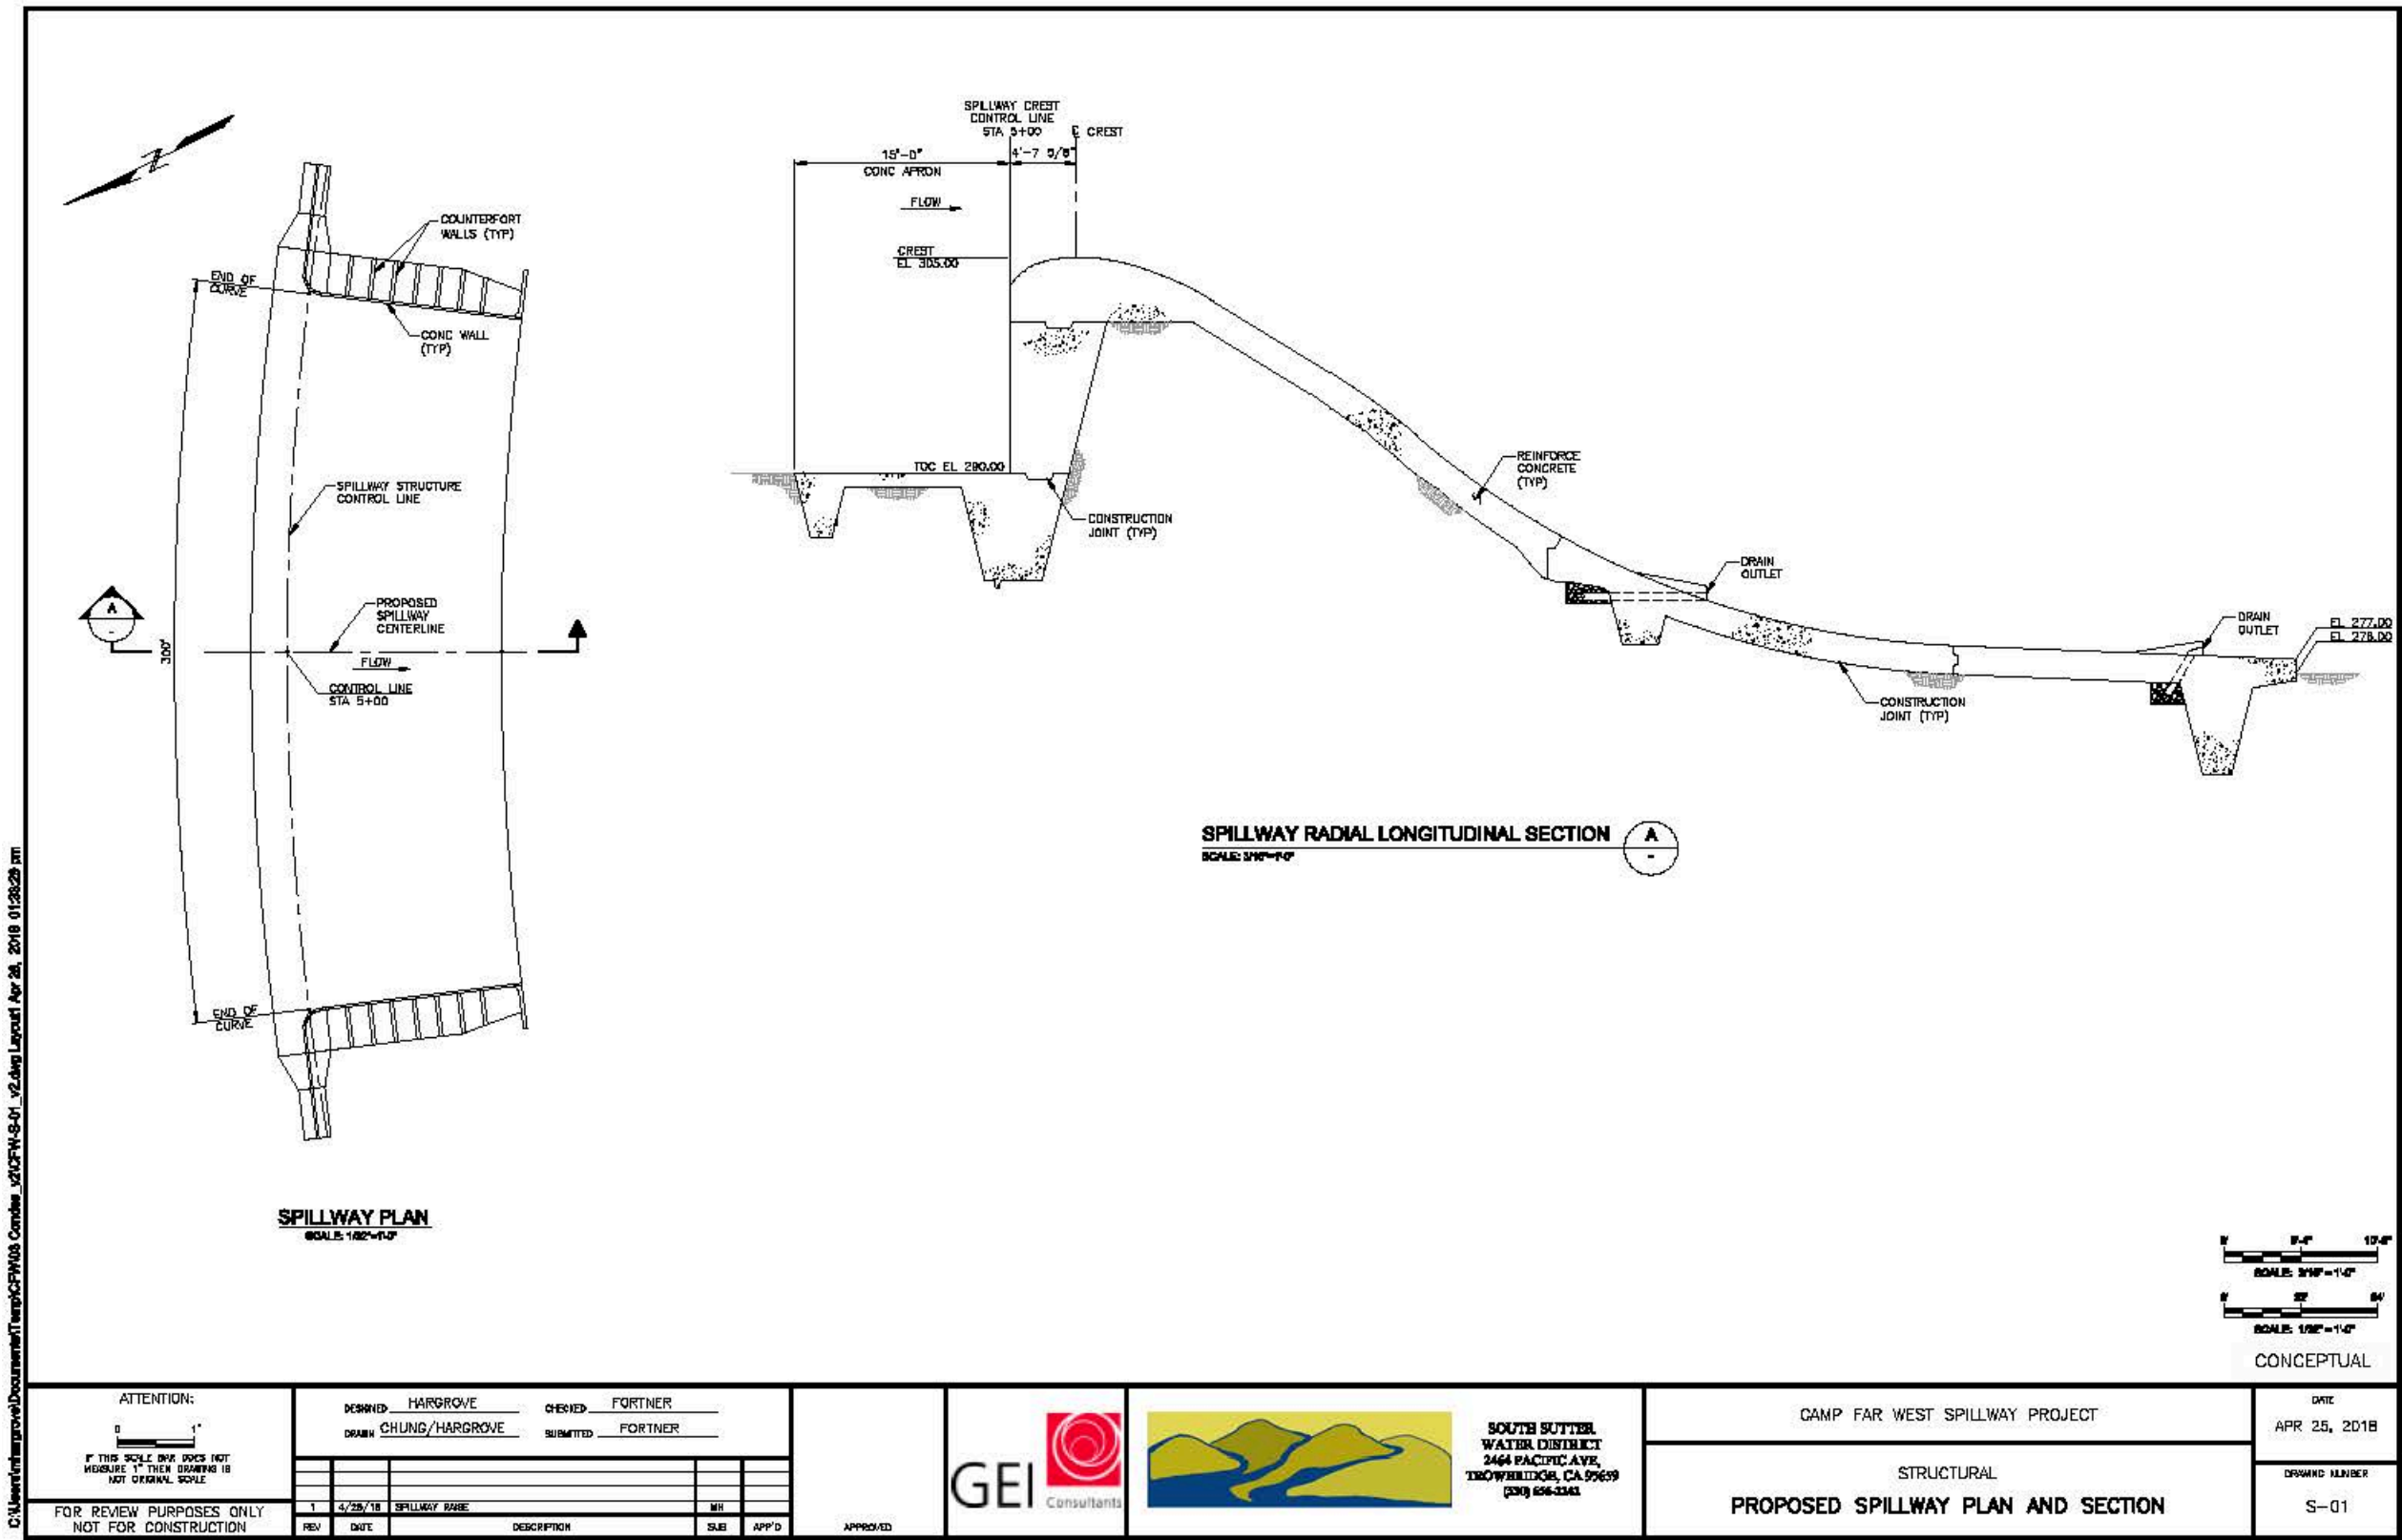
Conceptual level plan for Camp Far West Reservoir Pool Raise – spillway and road typical sections.
